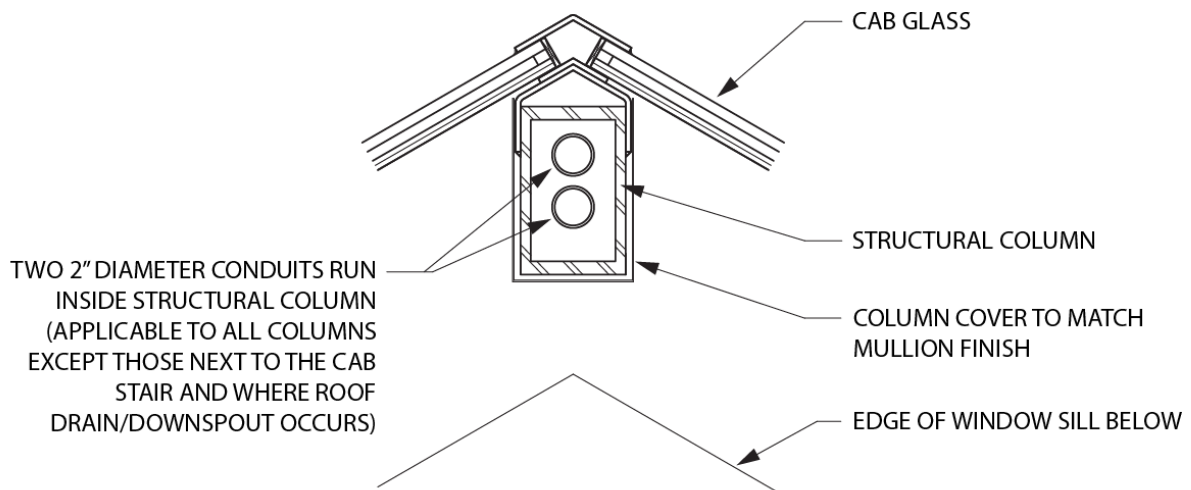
Plan Detail at Control Cab Window Mullion and Structural Column (Navy)
